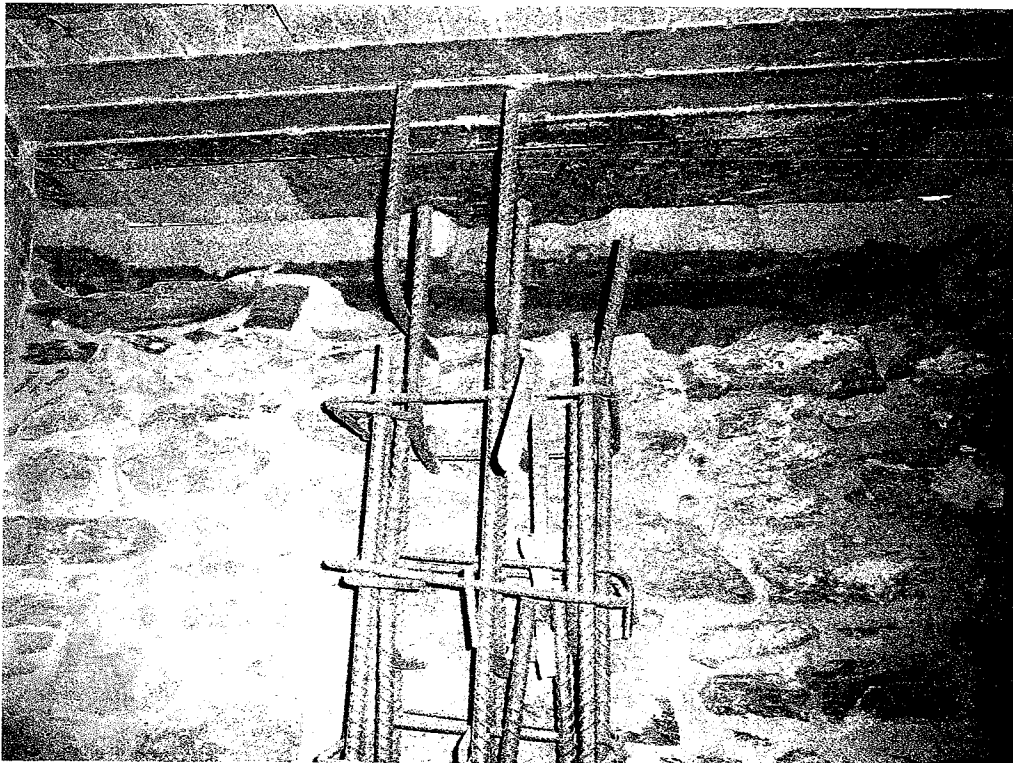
Demolition of top of existing stone foundation at Grid A/2.5, Note existing column A/2.6 removed.
